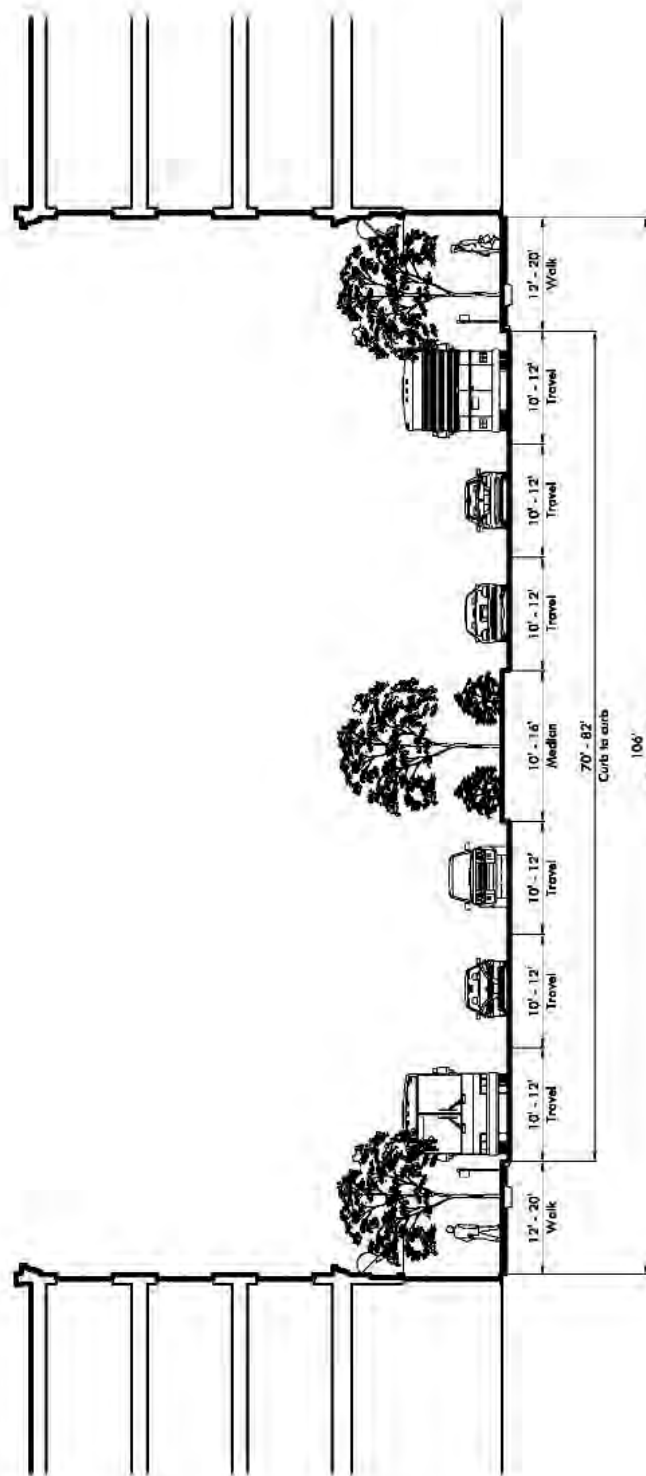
Typical "A" Street with 90'-100' Right-of-Way Section
